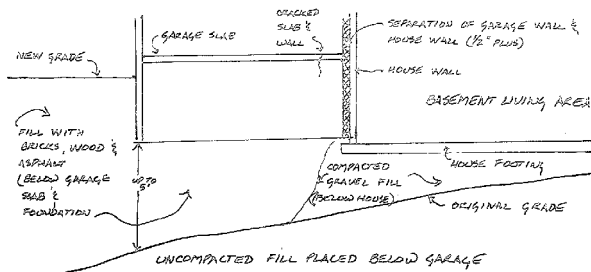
In leveling this site, fill material was properly placed and compacted under the house. But under the garage, the fill was sloppy. It later consolidated—and the slab and walls cracked.
